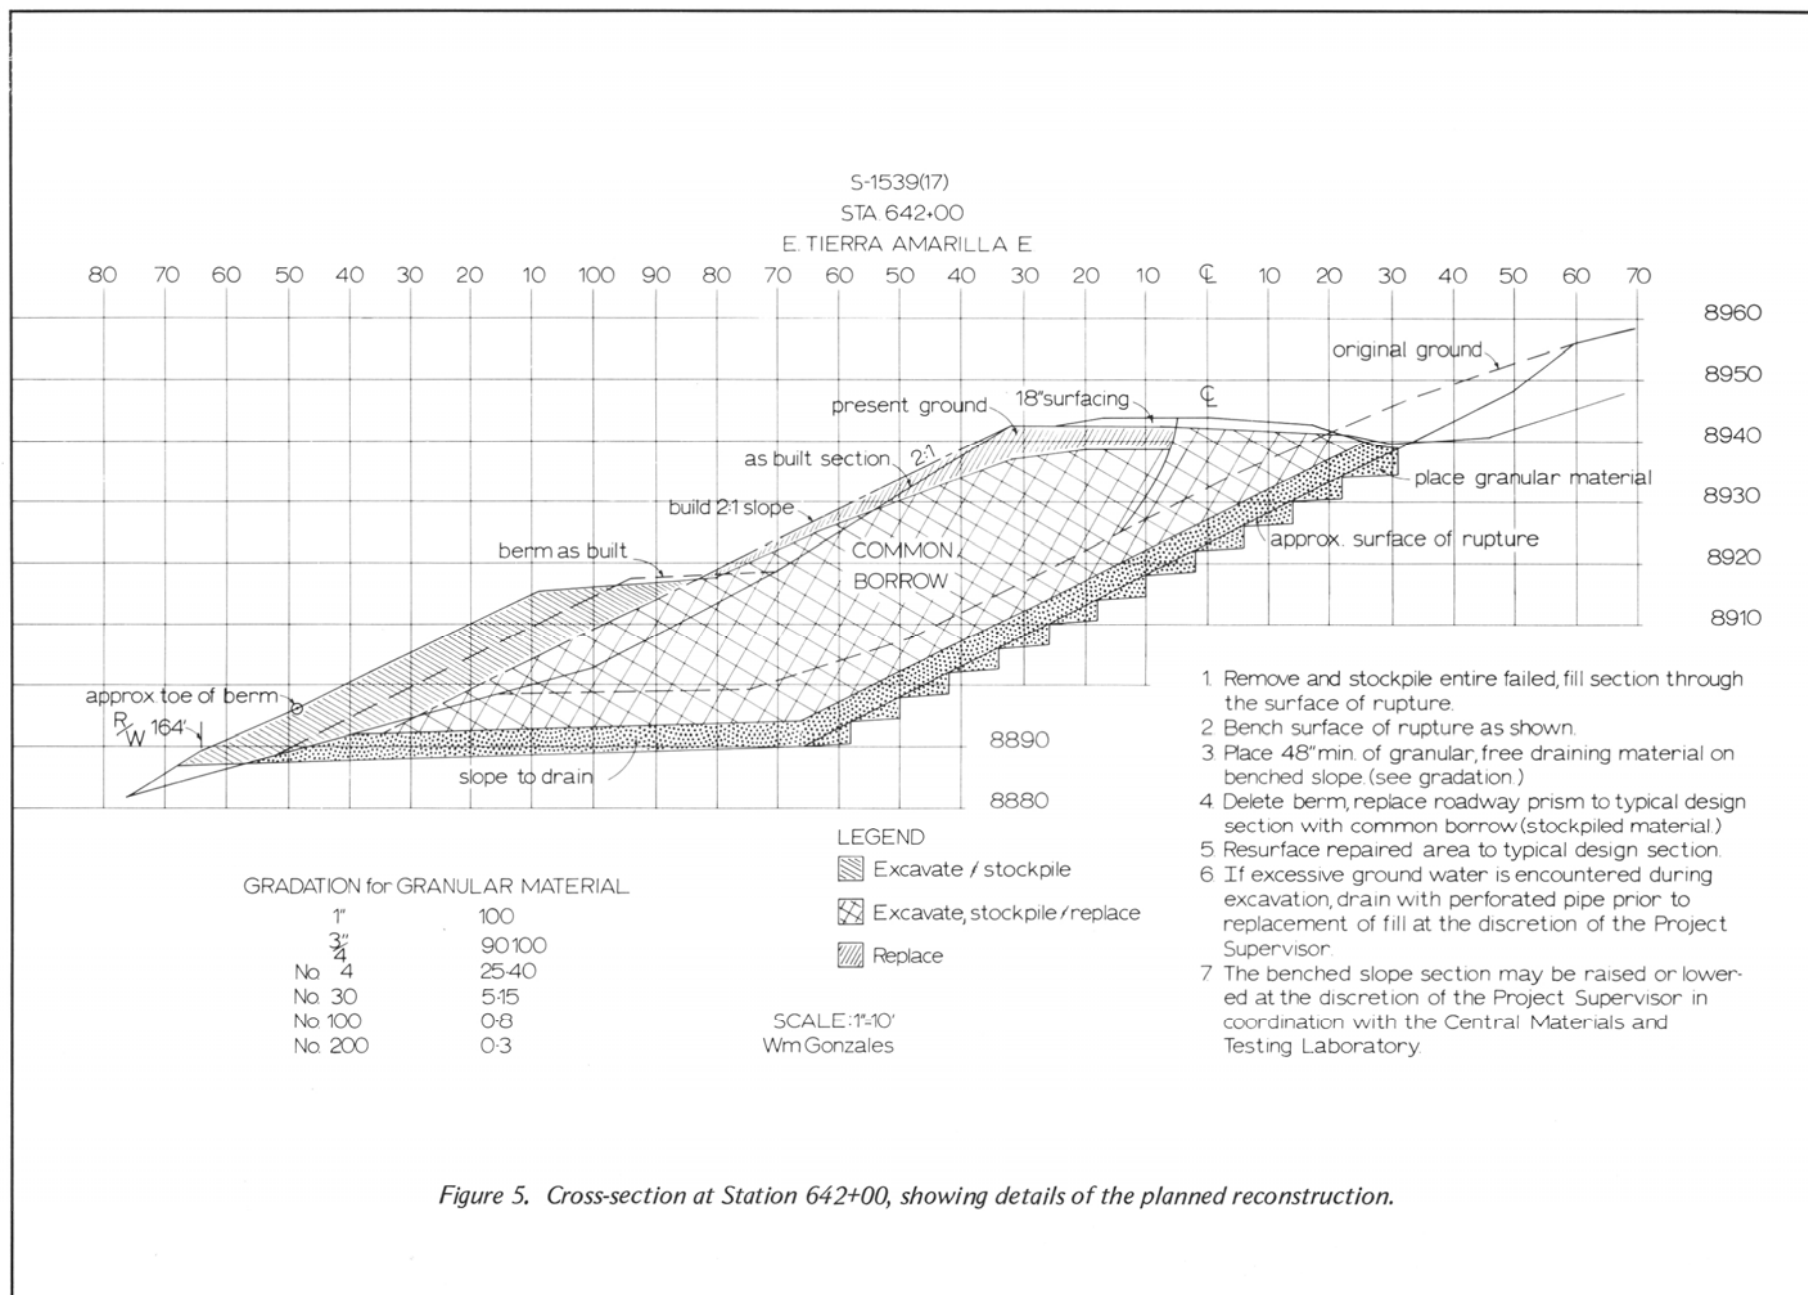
Cross-section at Station 642+00, showing details of the planned reconstruction.
